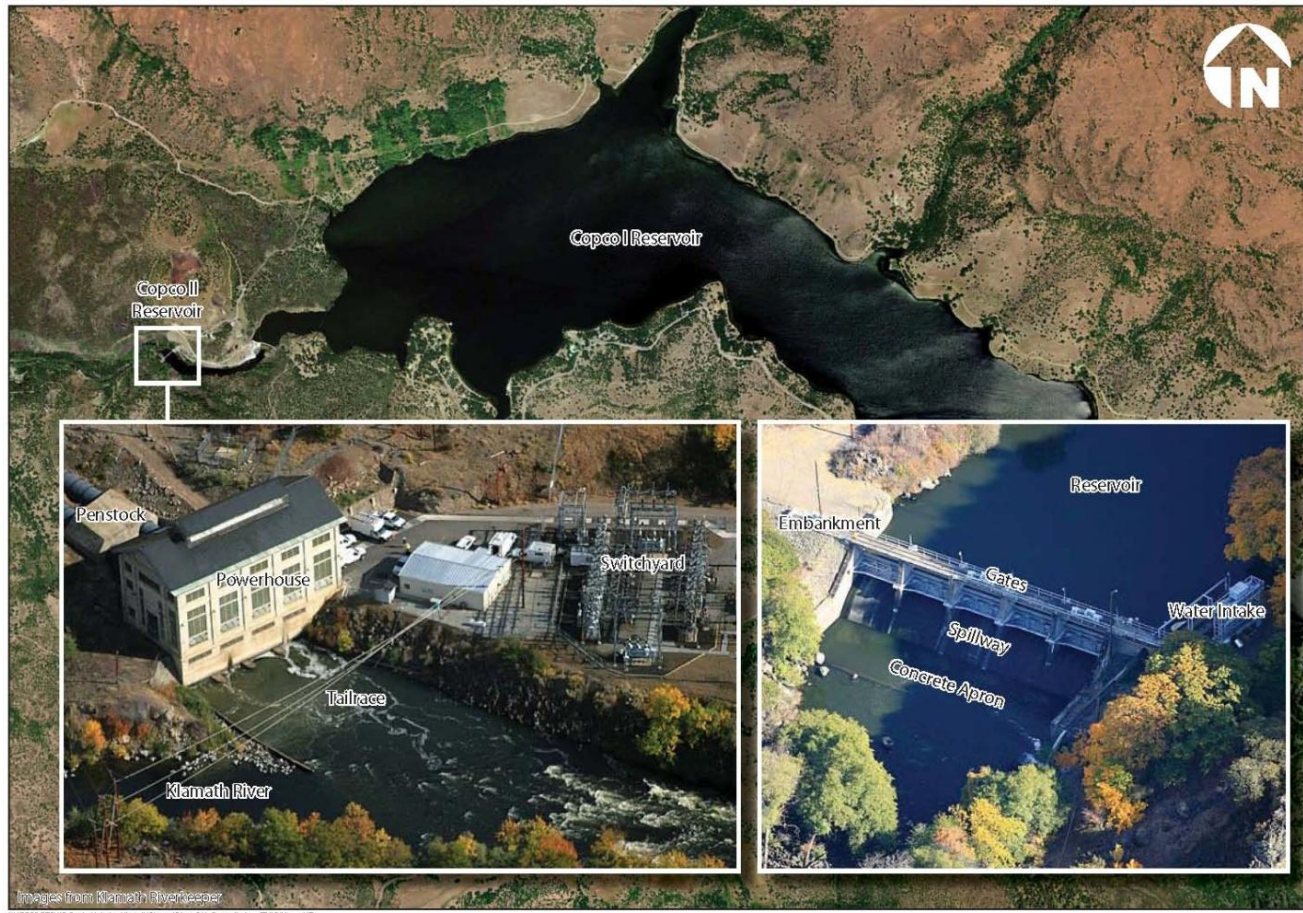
Copco 2 Powerhouse (left photo) and Dam
